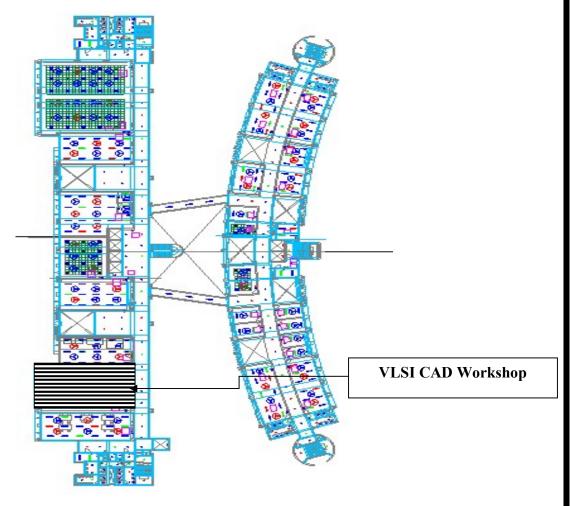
Floor Plan View of VLSI CAD Workshop
